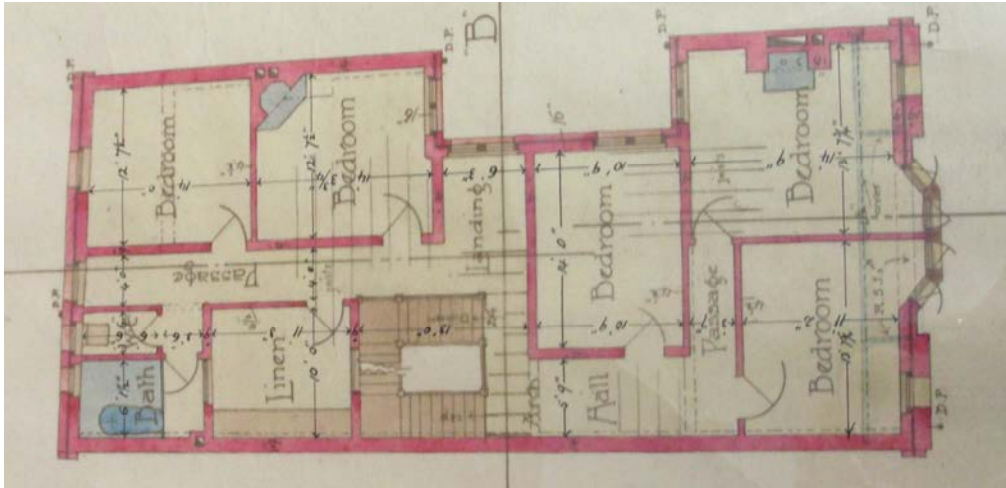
Second floor plan showing 5 bedrooms, a linen store and shared bathroom facility at the rear.
